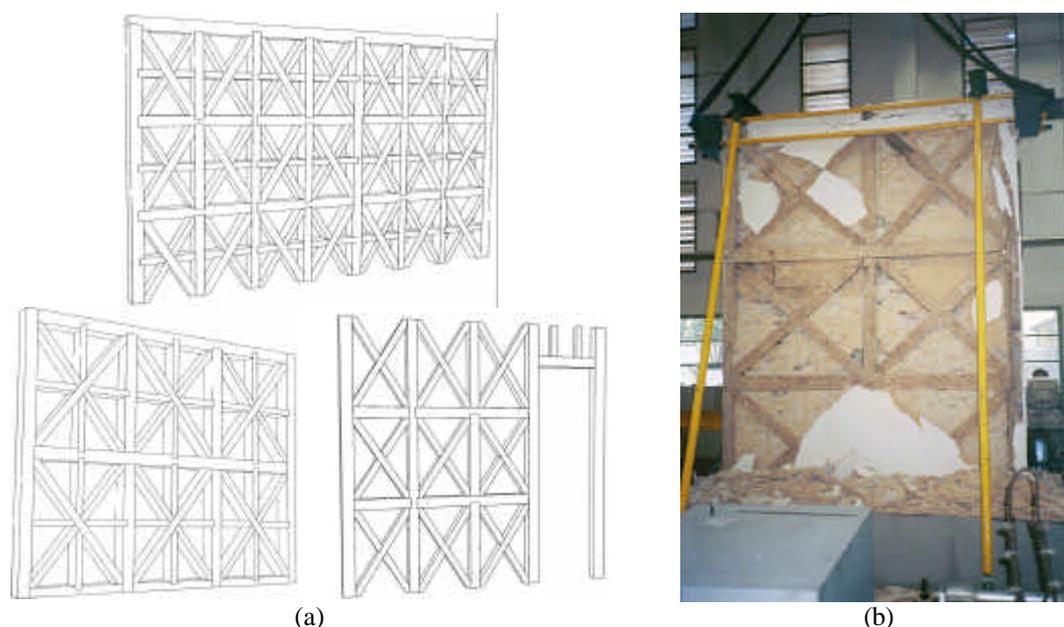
Examples of the composite timber-masonry walls: (a) three main types of internal timber arrangement; (b) a large specimen recovered from a demolition, used for laboratory test up to collapse.
